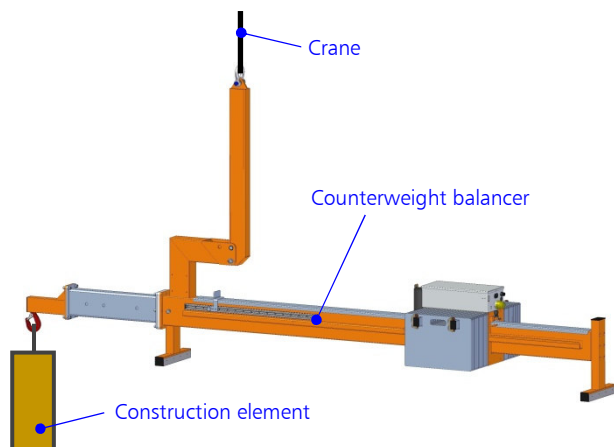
Load lifting attachment GGA 800 24/2,0/4,8 oVH-e
